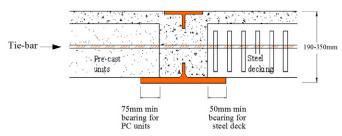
Schematic cross section of the composite shallow floor beam with web openings [1].
